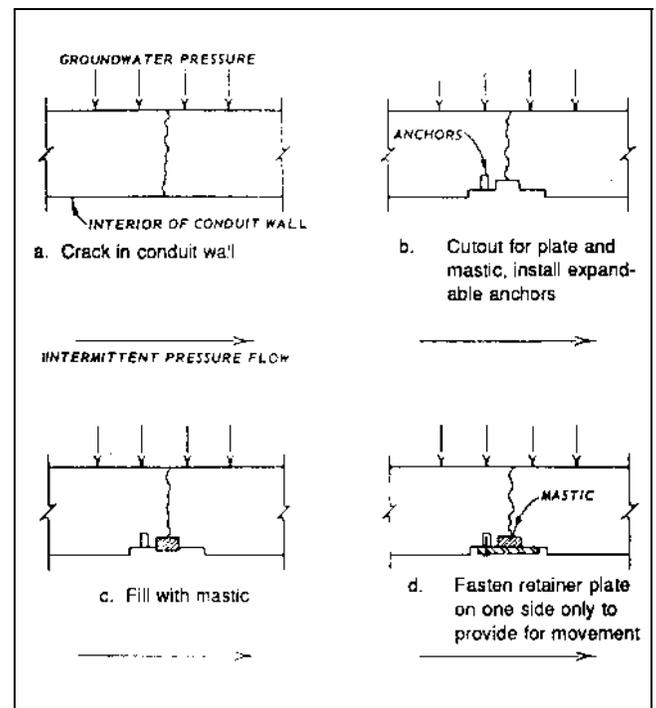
Repair of crack by use of a retainer plate to hold mastic in place against external pressure
